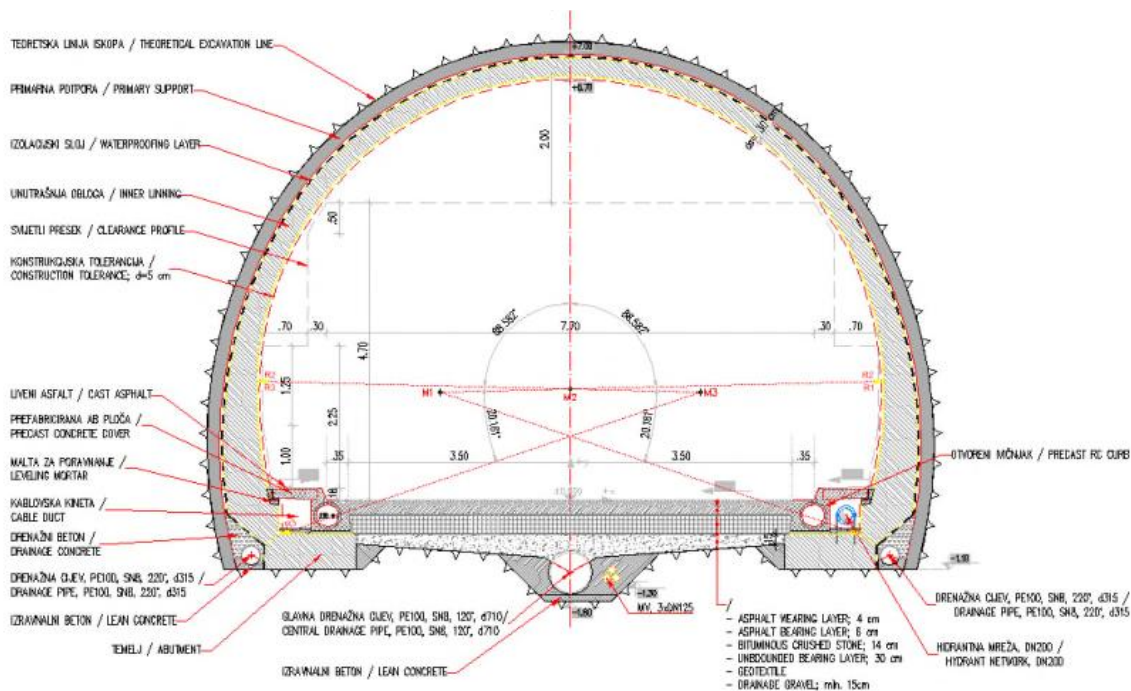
Typical cross section of the Prenj Tunnel main tubes
